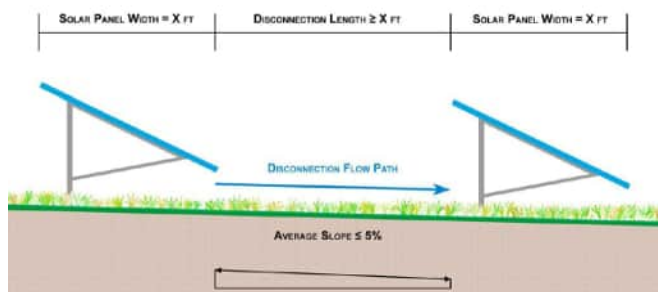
Typical installation for slope $\leq 5\%$ (MDE 2013).
